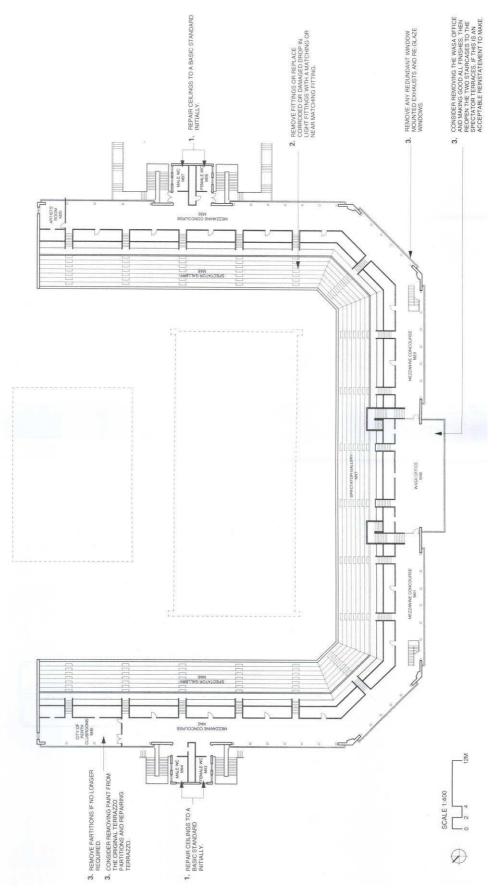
Beatty Park Leisure Centre – Mezzanine Floor Plan (Conservation Works).
